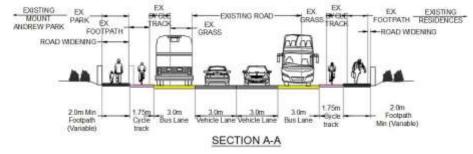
Section 1 Full Route Option Cross-Section A-A
